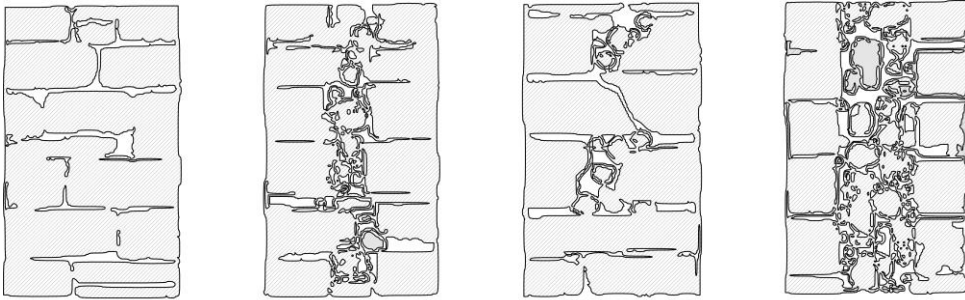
Types of external stone masonry walls, Azores. Source: [5]
